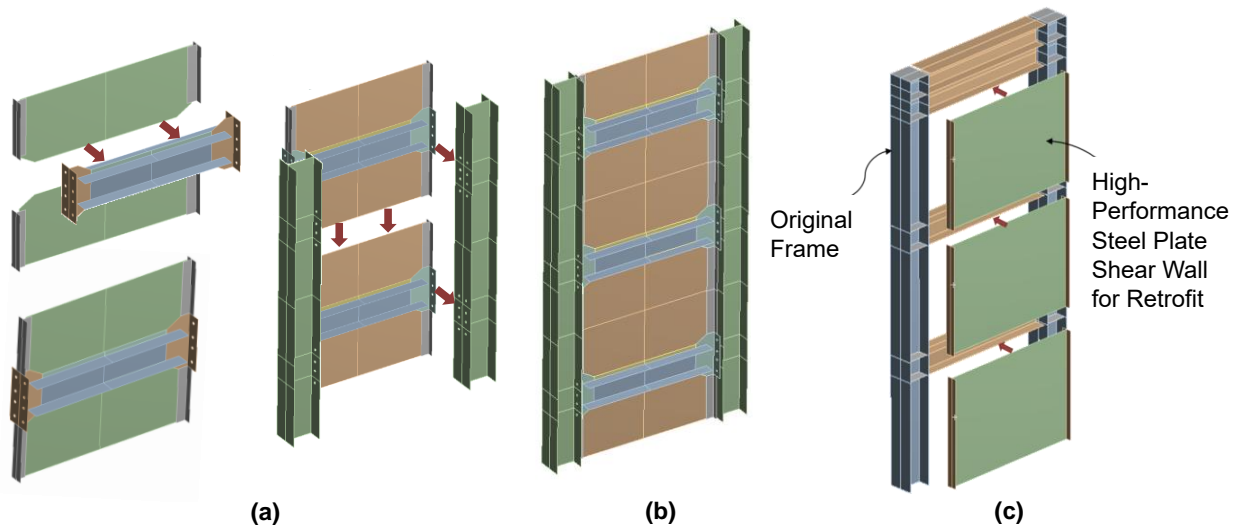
(a) Modular construction, (b) use of the new High-Performance Steel Plate Shear Wall system in new construction of buildings, and (c) use of the new system in retrofit of existing structures
